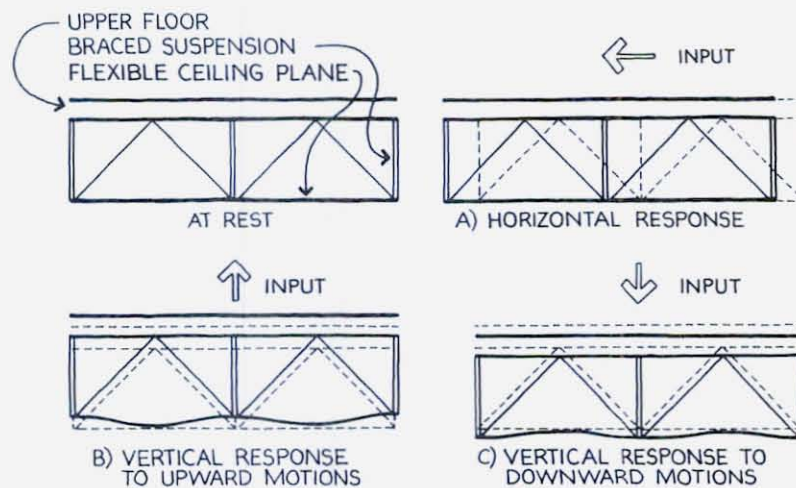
CEILING TYPE: FLEXIBLE CEILING PLANE - BRACED SUSPENSION.
